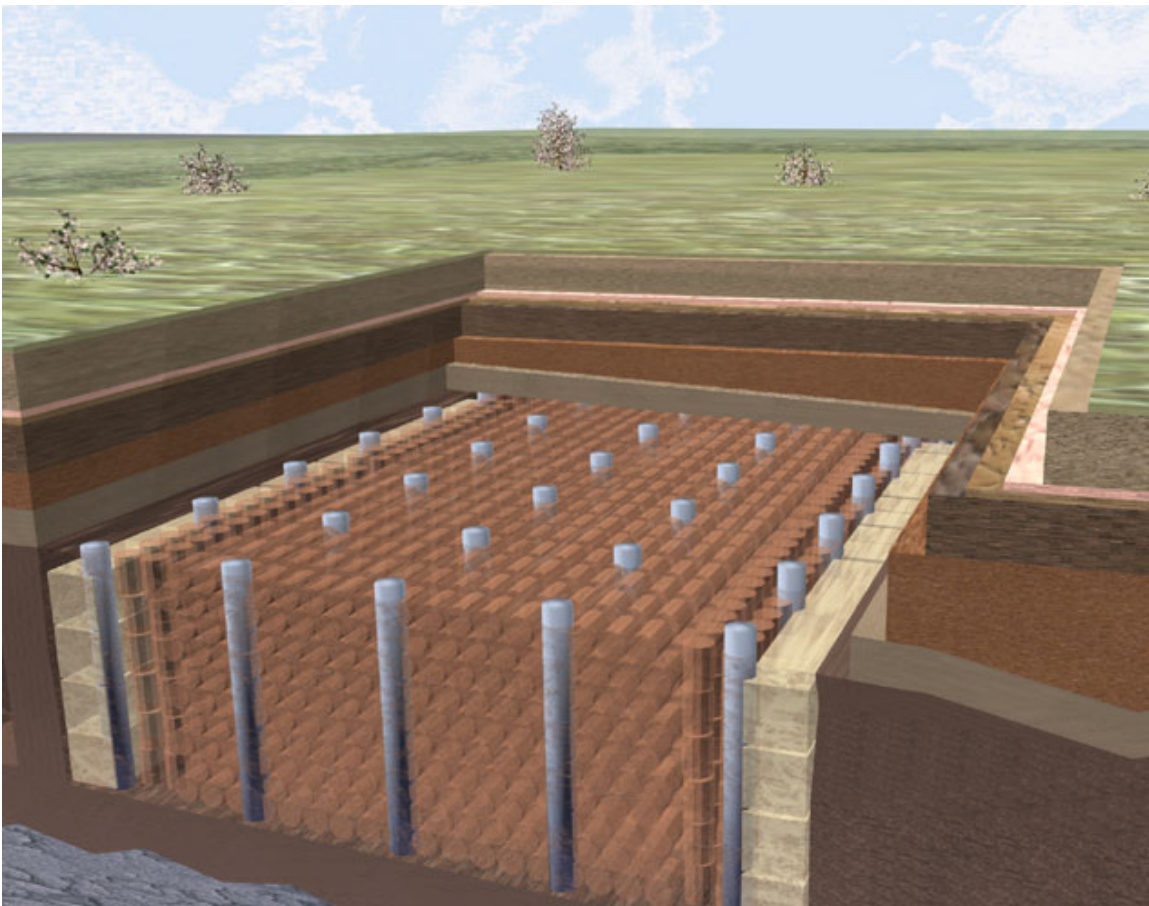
Rendered cutaway sketch of grouted columns in a typical Subsurface Disposal Area pit.
